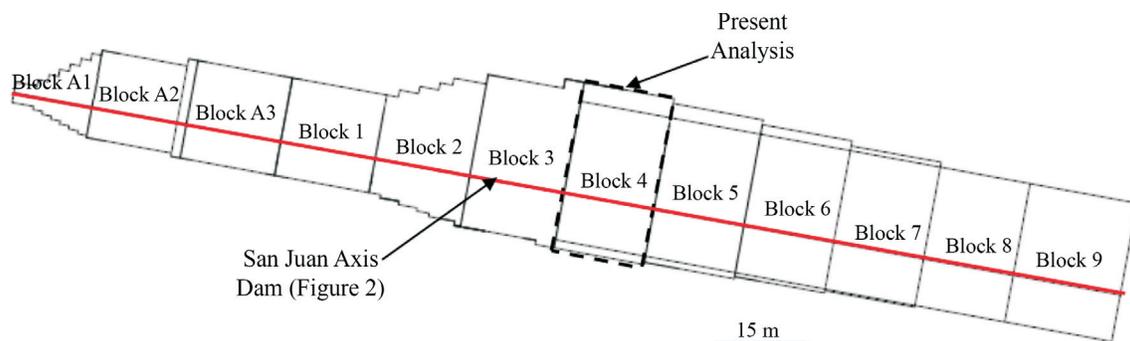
General arrangement of the San Juan Dam. Original scale 1:250.
